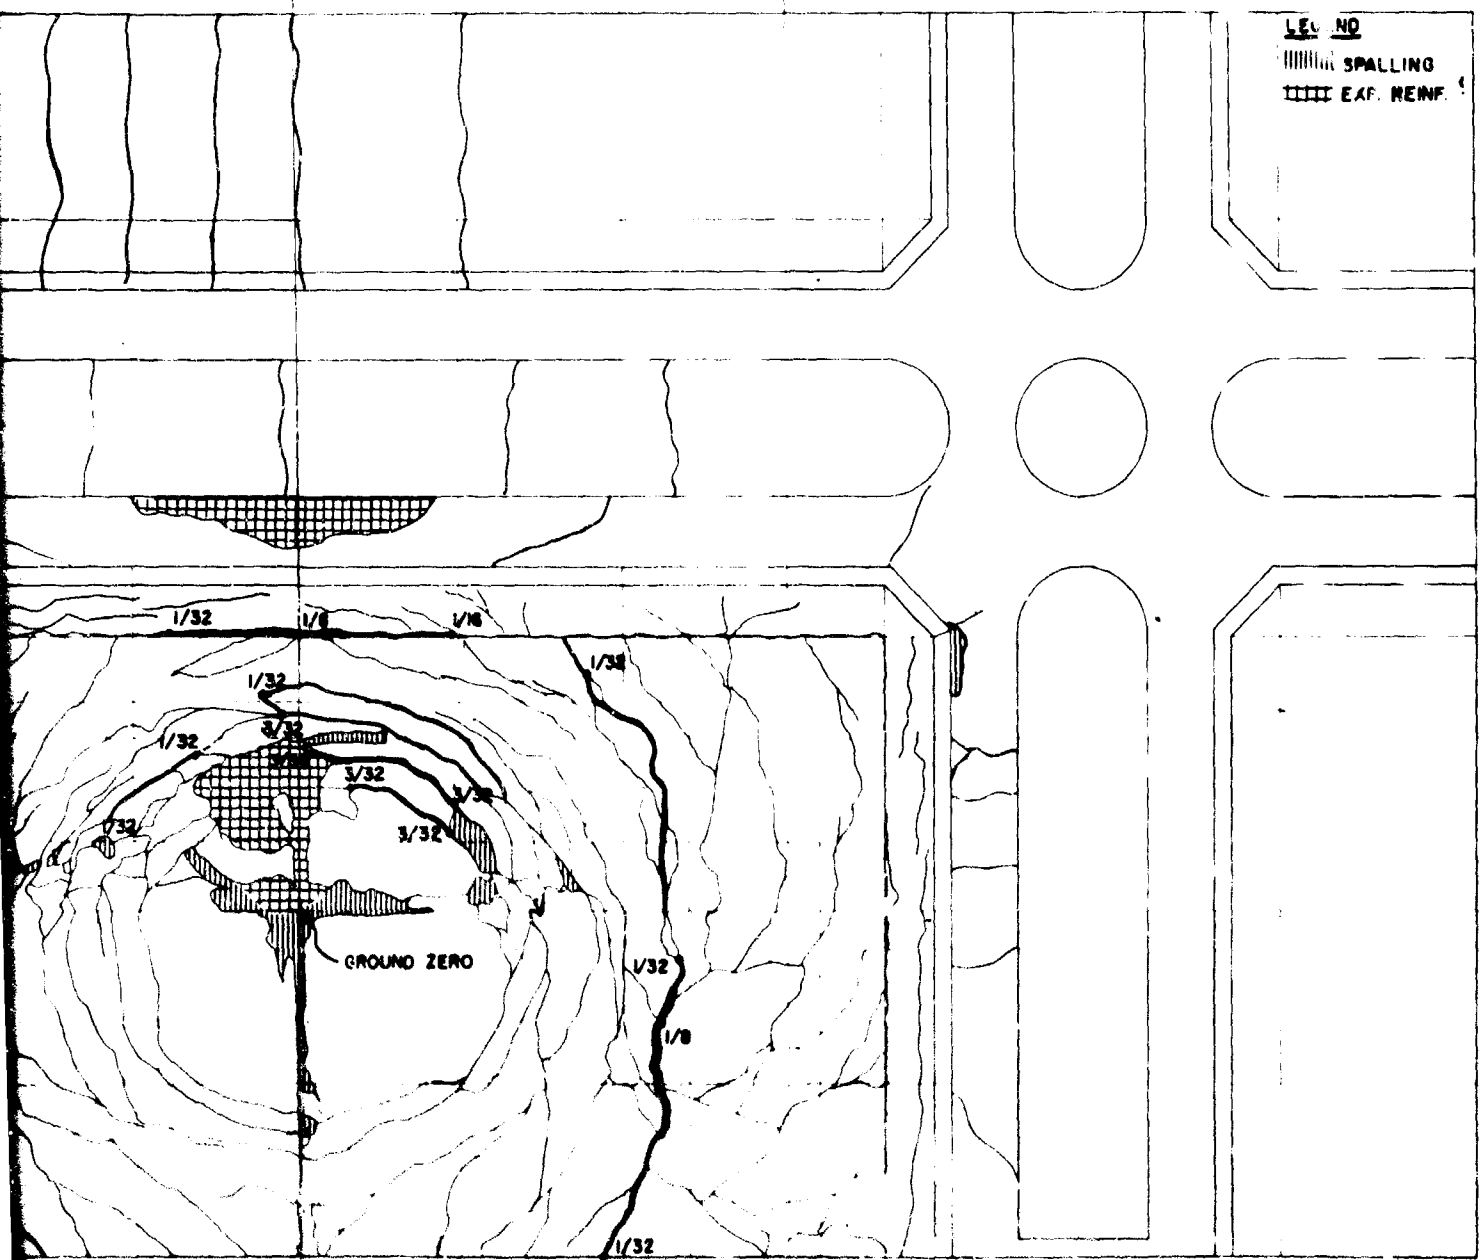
DAMAGE TO STRUCTURE - PLAN VIEW - ROOM
